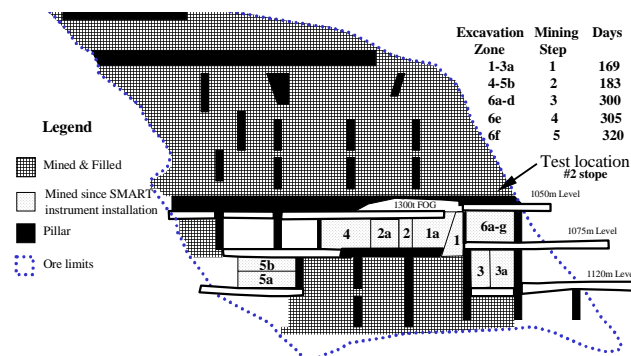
Longitudinal section of the Callinan East Zone showing the excavation zones in the mining sequence.
